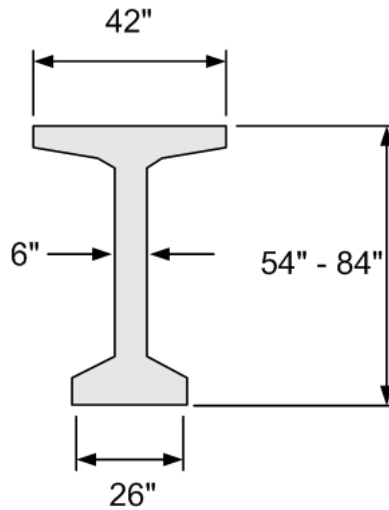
AASHTO Cross Sections of Prestressed I-beams
